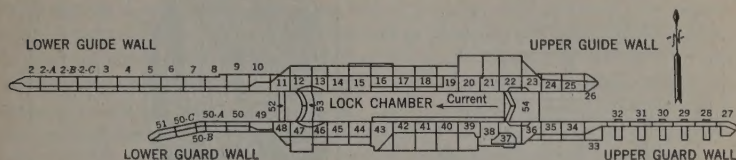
SCHEMATIC PLAN; CHICKAMAUGA LOCK
